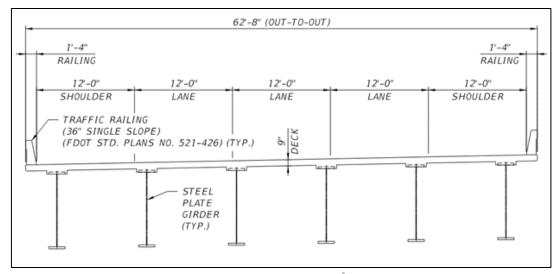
Typical Section of Proposed C-D Road Bridge over Cypress Creek
